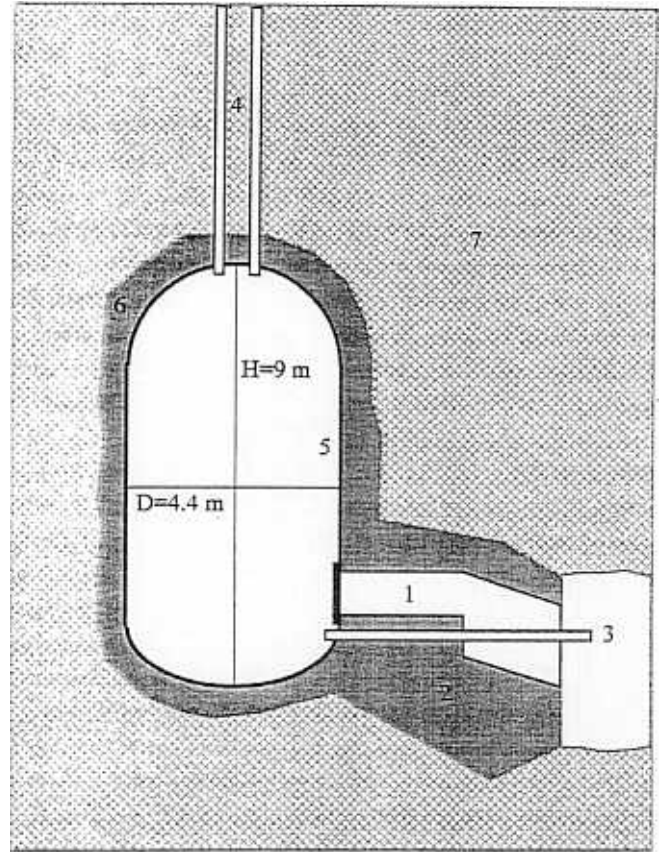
General layout of Room 2. 1. Access tube, 2. Concrete plug, 3. Water fill, 4. Gas fill, 5. Steel lining (6 mm), 6. Concrete lining (0.6 m), 7. Rock mass.
